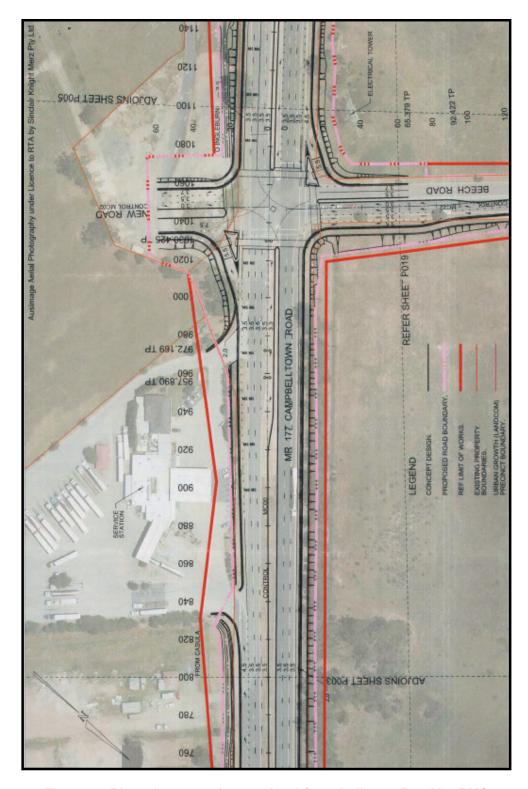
Plan of proposed upgrade of Campbelltown Road by RMS
